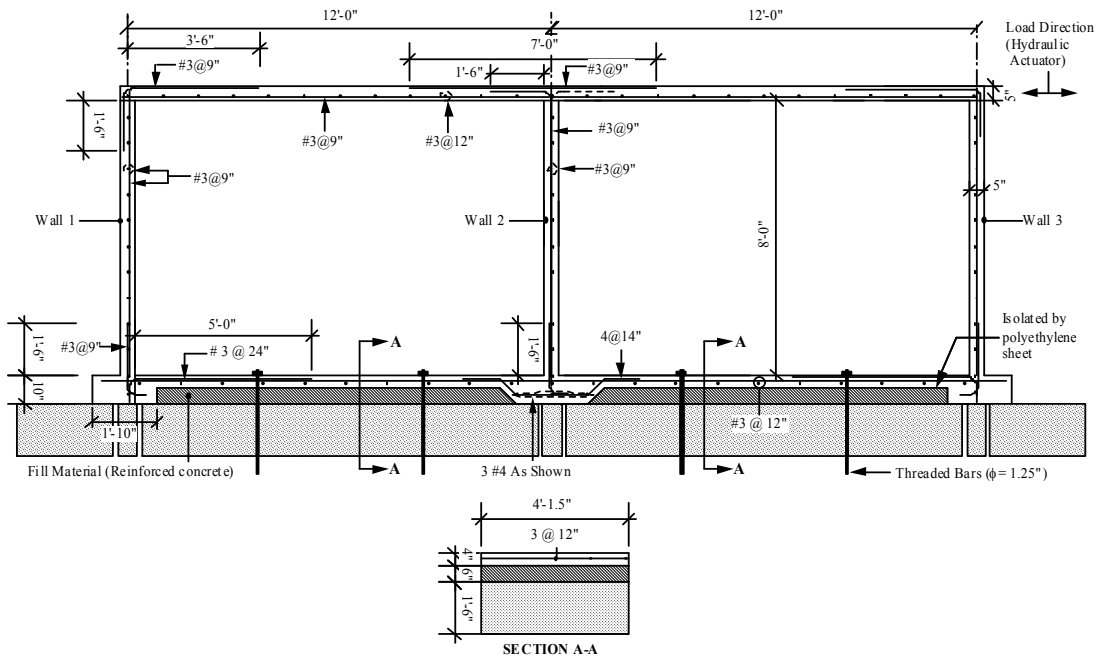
Details of dimensions, reinforcement and foundation for Specimen 1-Control Model.
